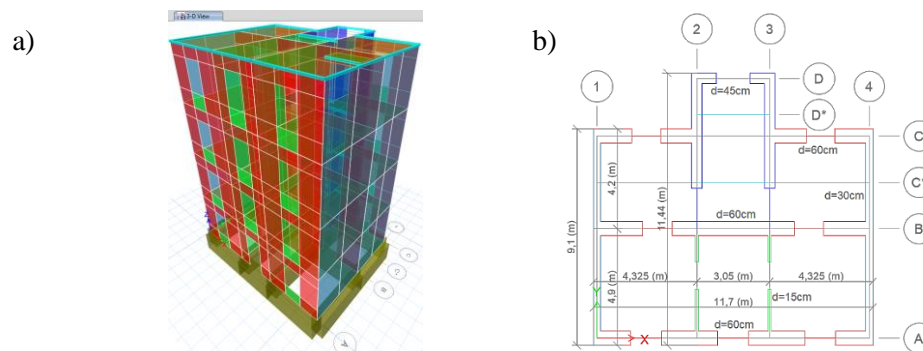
a) 3D numerical model in ETABS; b) Building plan
